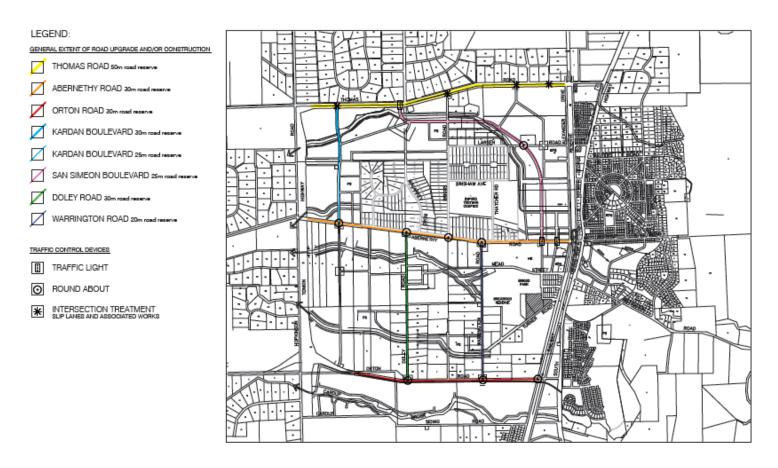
ROADS TO BE UPGRADED AND/OR CONSTRUCTED THROUGH THE DEVELOPMENT CONTRIBUTION ARRANGEMENT (AND TRAFFIC CONTROL DEVICES)
